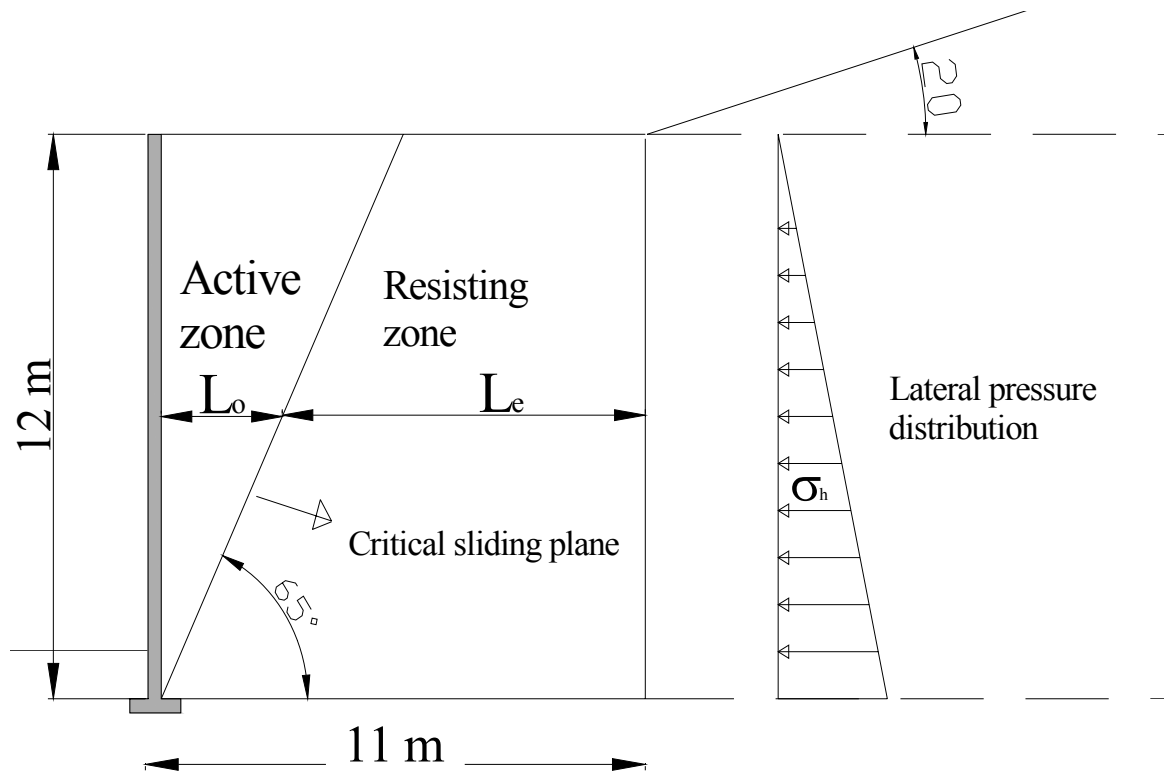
Dimensions of reinforced earth structures for interior stability analysis
